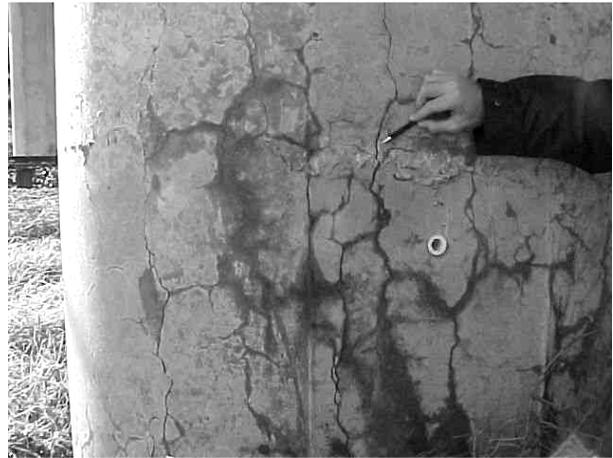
Severe AAR cracking on abutment breast wall (B2960).
